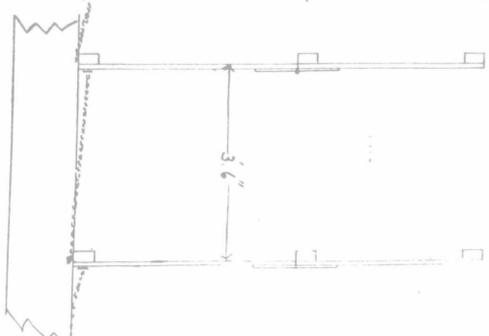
Ground-floor plan of Mr. Wells' cow stall.
